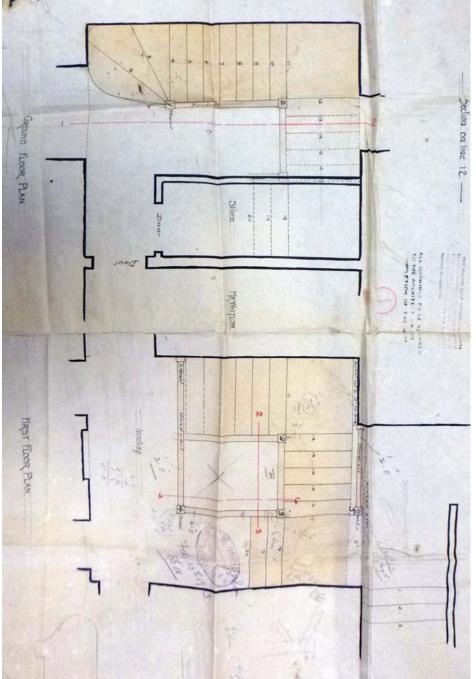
Council offices and first floor plan, dated 1903 (CAC(B) Z/1028/1 c1903)
